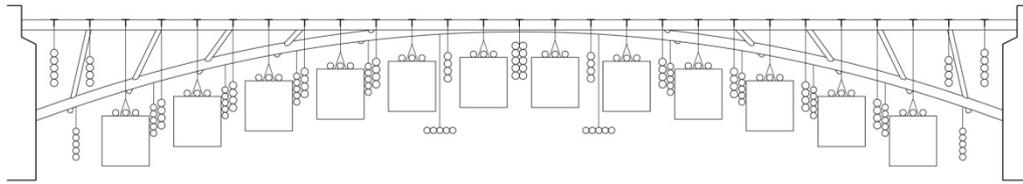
The scheme of ballast load – rectangular concrete blocks and round steel pipes
